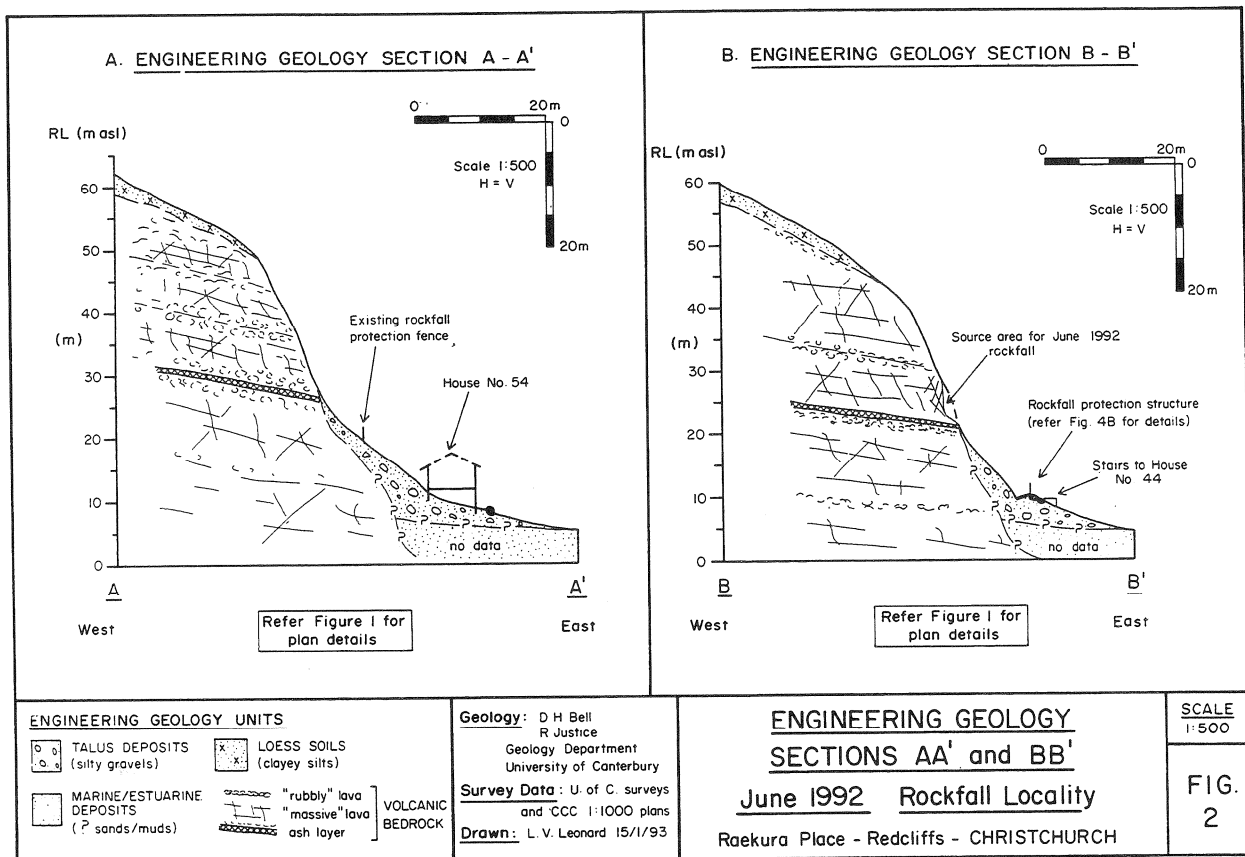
Engineering geology sections, Raekura Place rockfall site, Christchurch.
